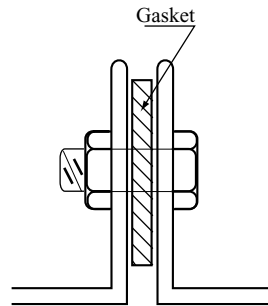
Sealing gasket at flange joint. Drive slips, fasteners, rivets or bolts are used to hold the pieces together.
